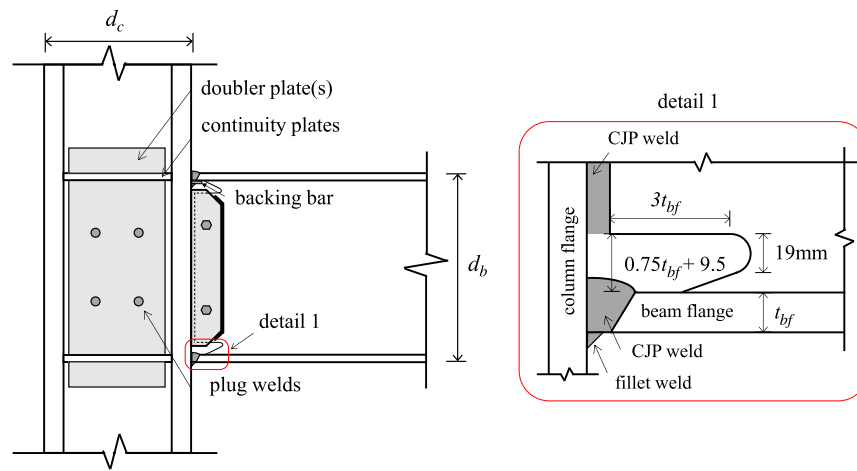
Typical welded unreinforced flange-welded web (WUF-W) prequalified connection detailing.
